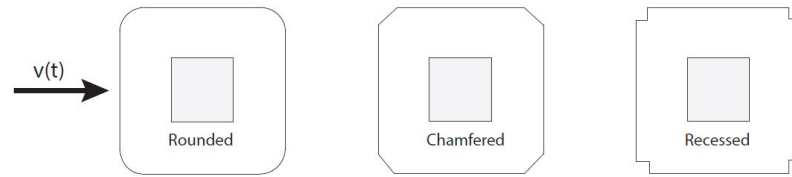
Plan views of rounded, chamfered and recessed corner modification.
